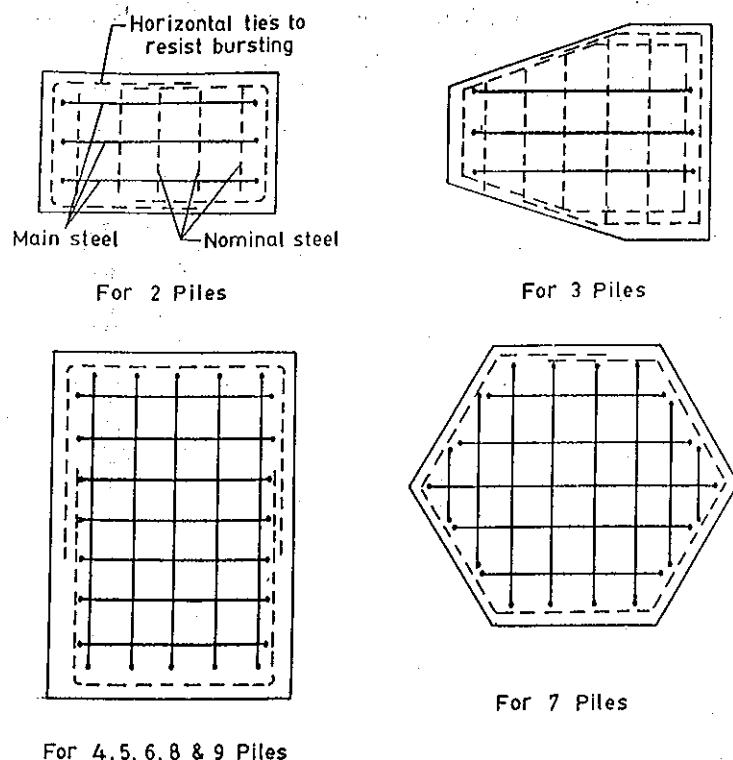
Plan Arrangement of Reinforcement in Pile Caps
